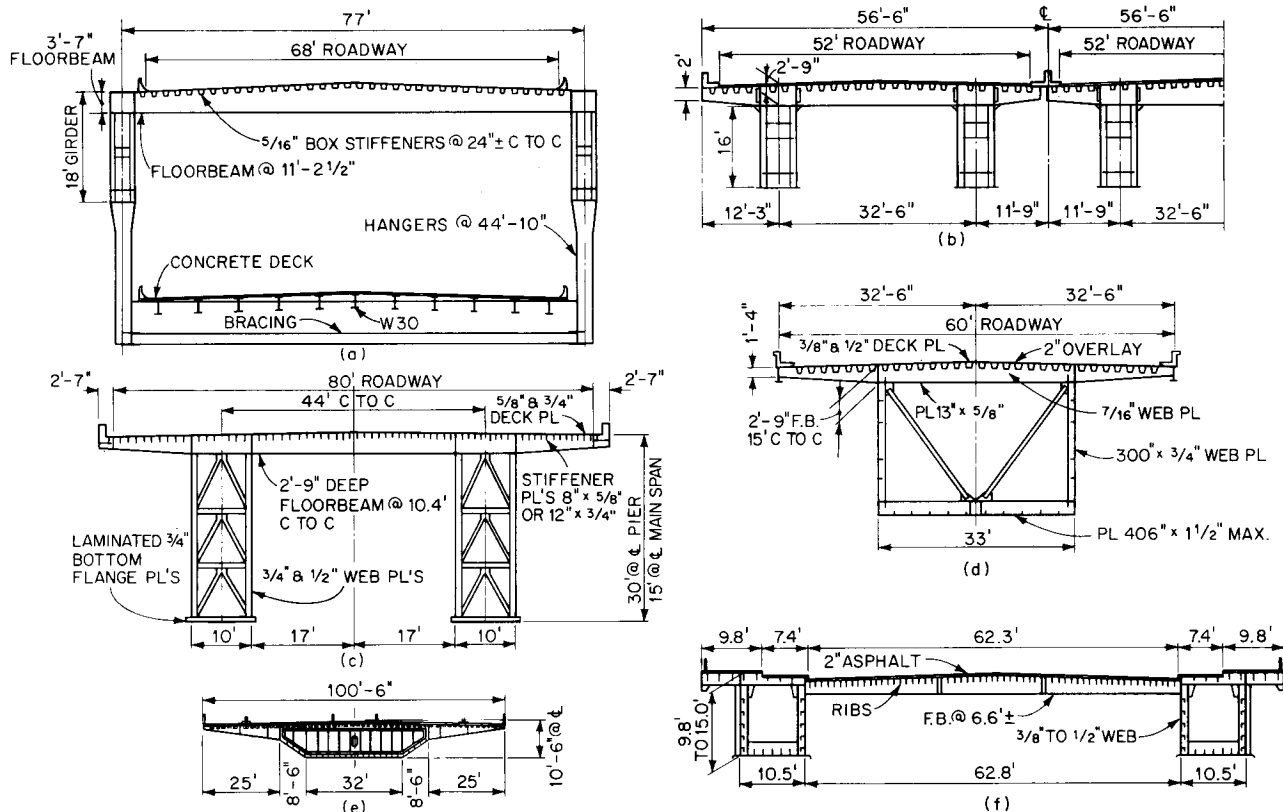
Examples of cross sections of orthotropic-plate highway bridges. (a) Fremont Bridge, Portland, Ore., incorporates continuous tied-arch spans of 448.3–255.3–448.3 ft. (b) Poplar St. Bridge over the Mississippi River at St. Louis has continuous spans of 300–500–600–500–265 ft. (c) San Mateo-Heyward Bridge over San Francisco Bay, Calif., contains three cantilever-type spans of 375–750–375 ft with a 375-ft suspended span and 187.5 cantilevers. (d) San Diego-Coronado Bridge over San Diego Bay, Calif., provides continuous spans of 600–600–500 ft. (e) Wye River Bridge, England, cable-stayed, spans 285–770–285 ft. (f) Severin River Bridge over the Rhine River, Cologne, Germany, also cable-stayed, has spans of 161–292–157–990–494–172 ft.
